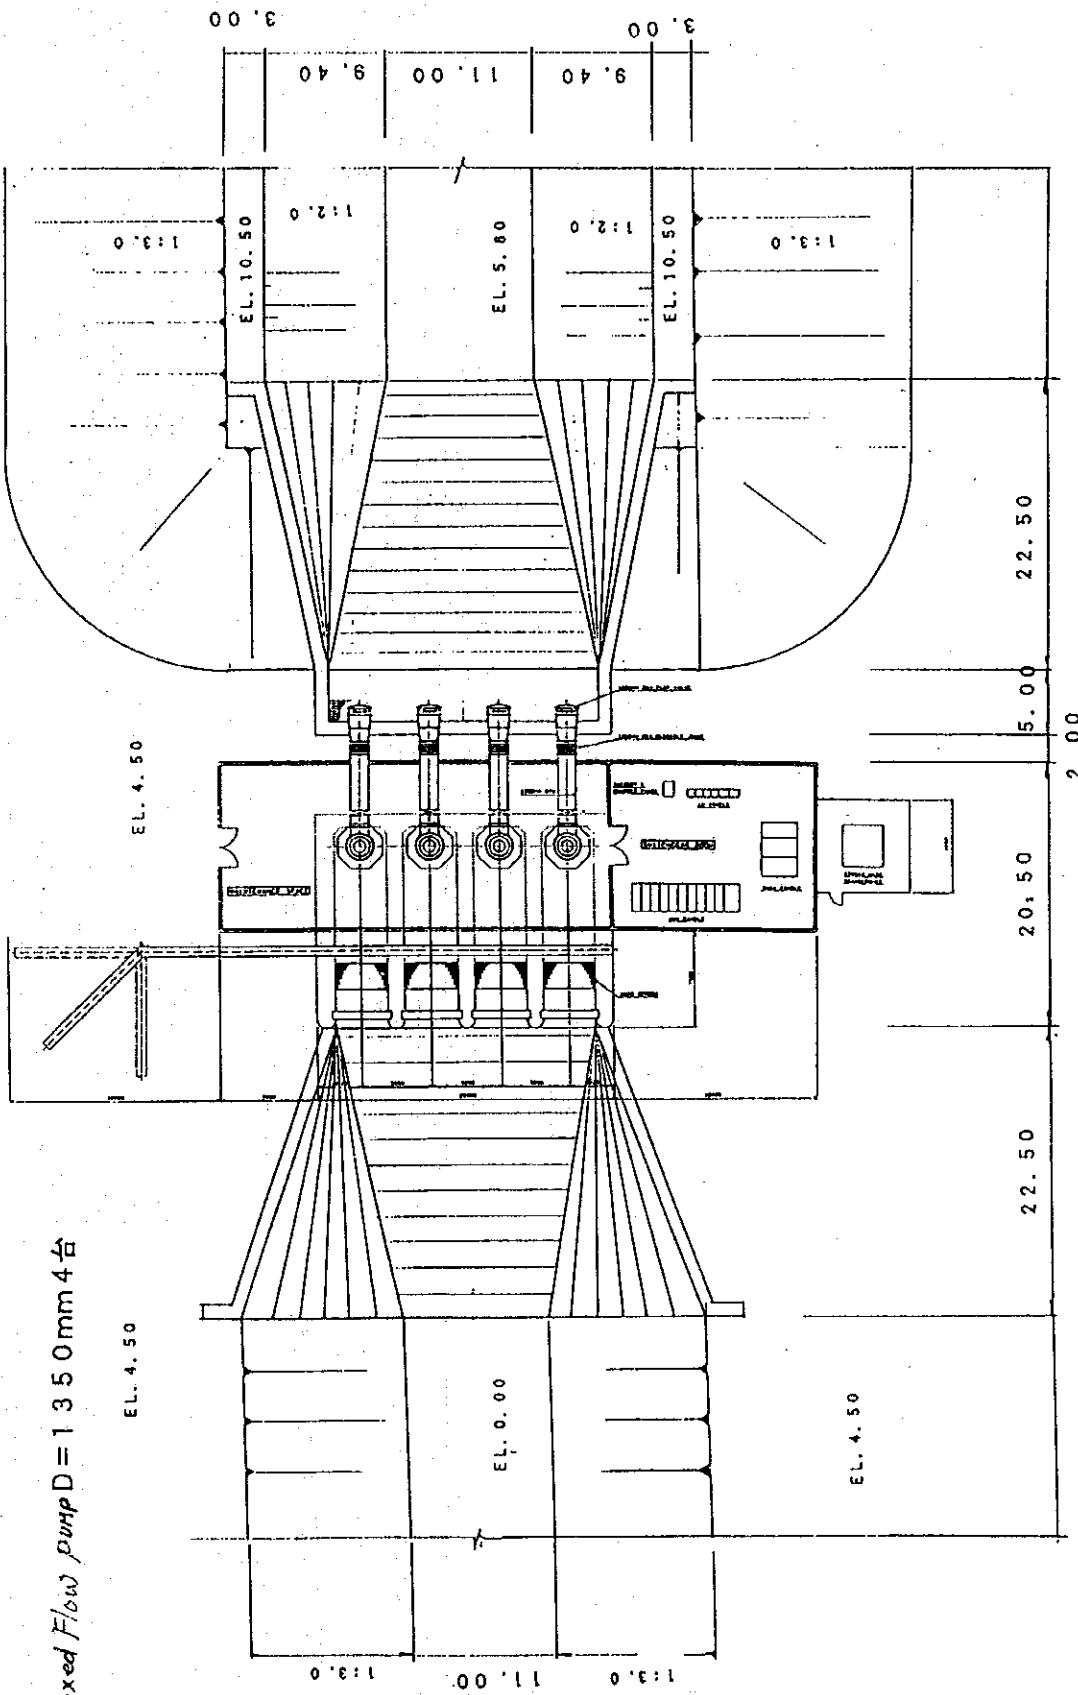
Lay-out Plan of Tan Chi Pump Station
